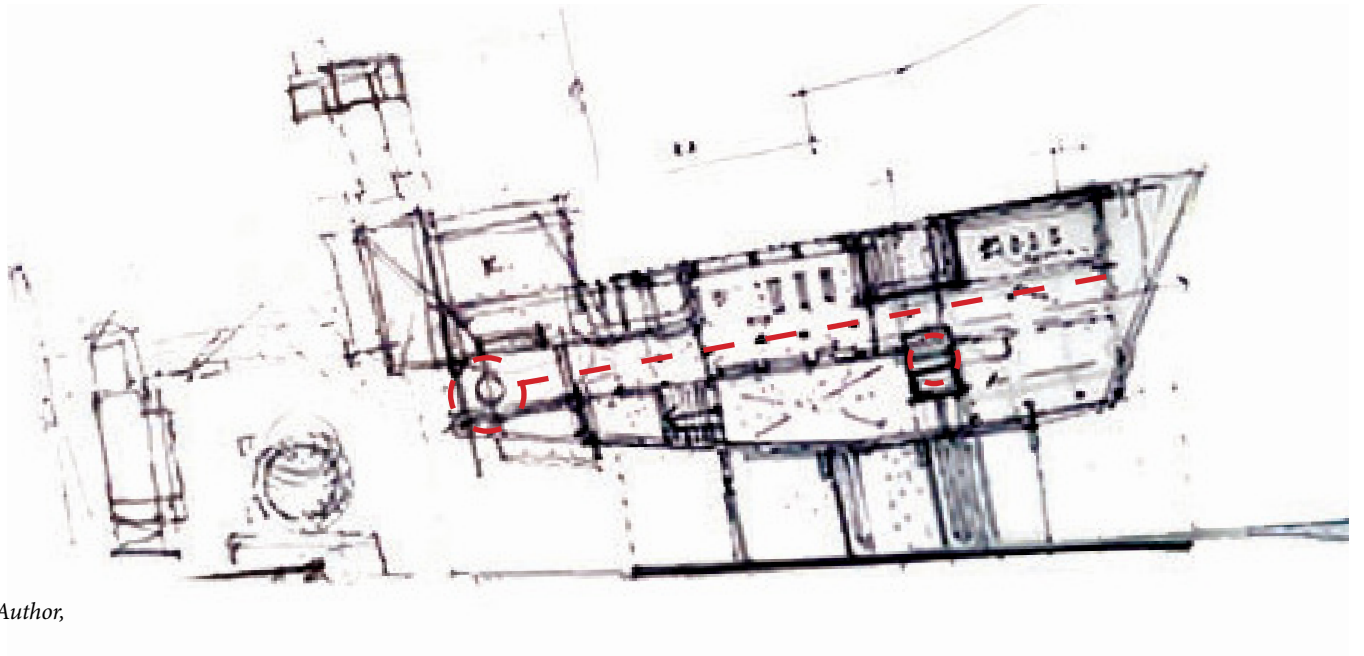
Design 2 - Level 1 floor plan development 2 (Author, 2019)
